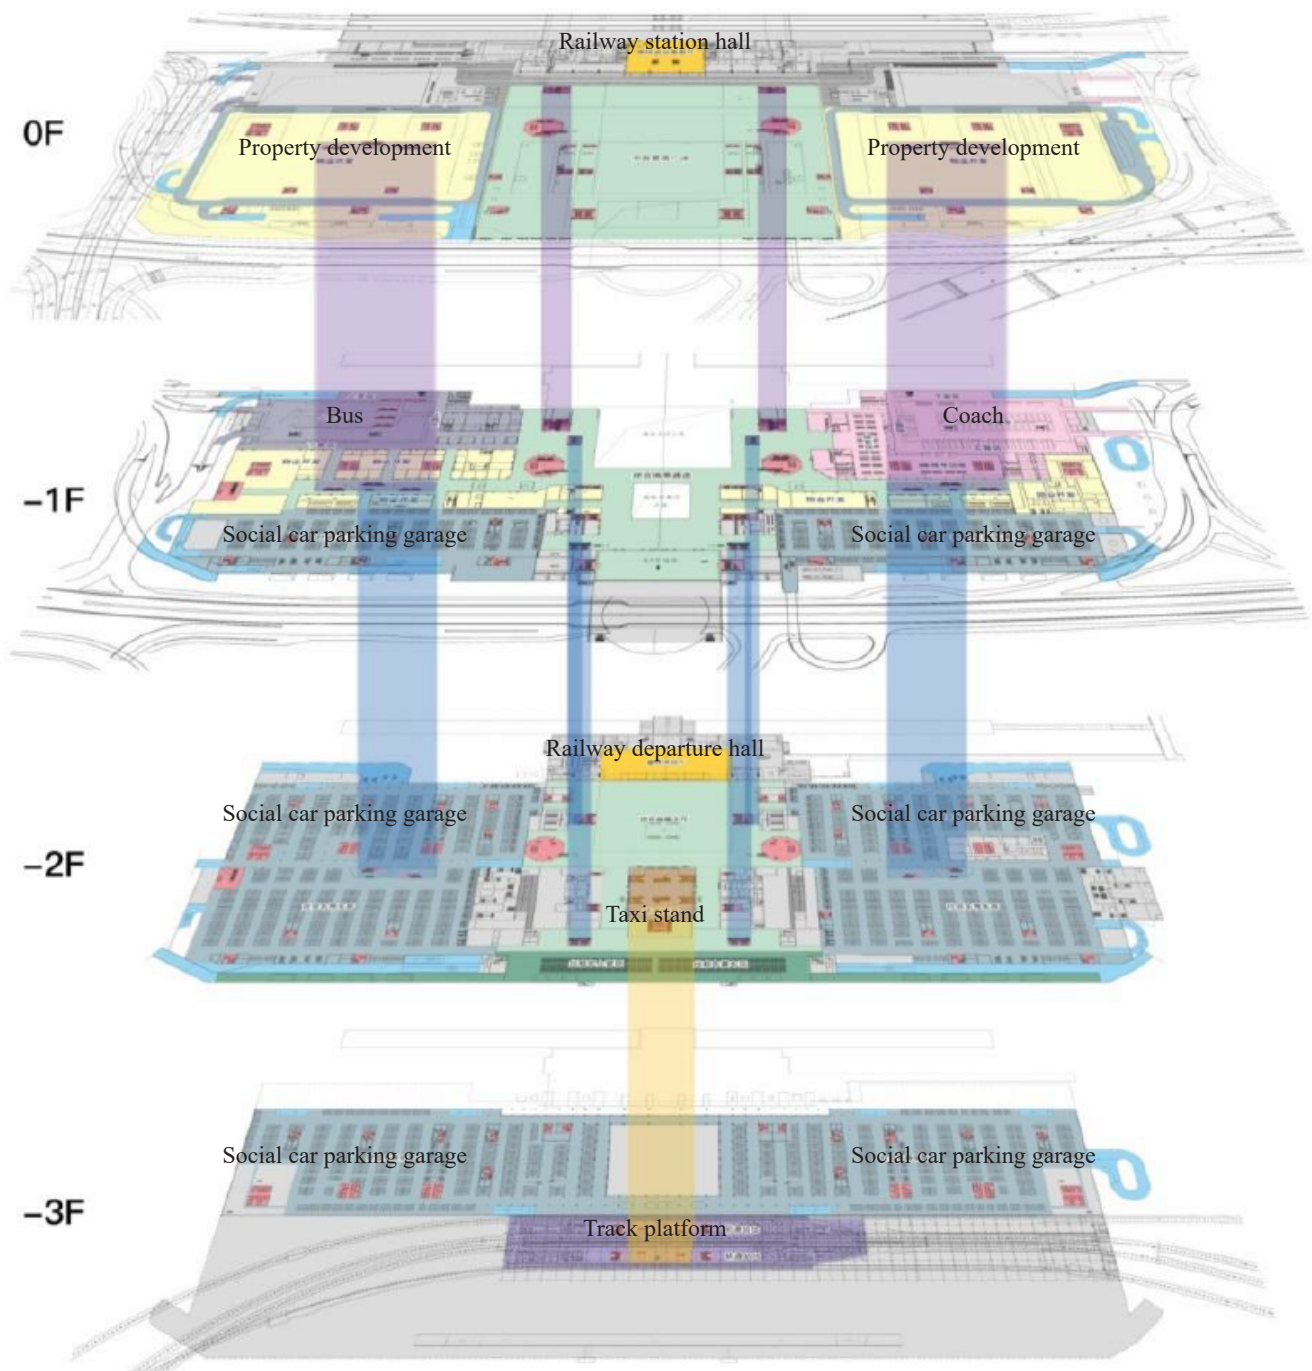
Traffic transfer connection design of Chongqing West Railway Station
